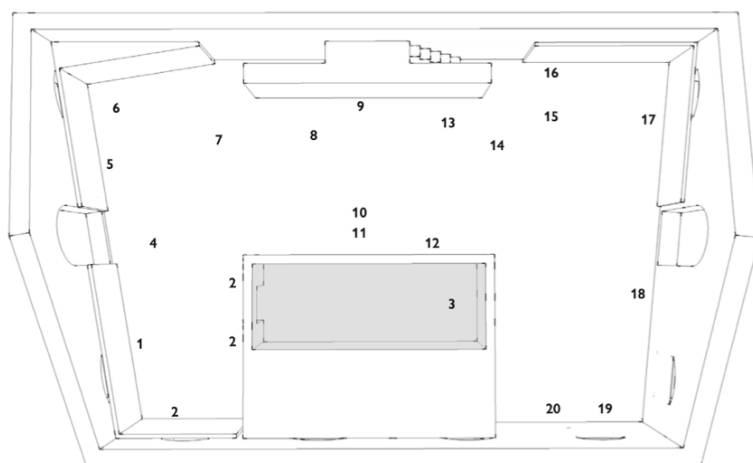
Floor plan Galeria Avenida da Índia, 2019.
